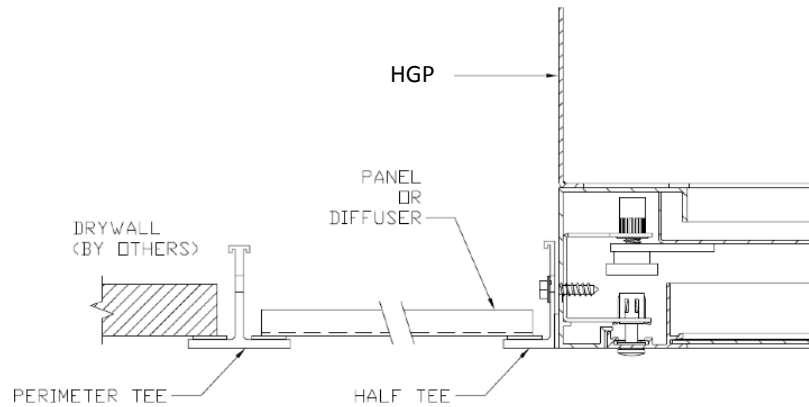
HGP with Perimeter HGWC and Drywall Elevation View
